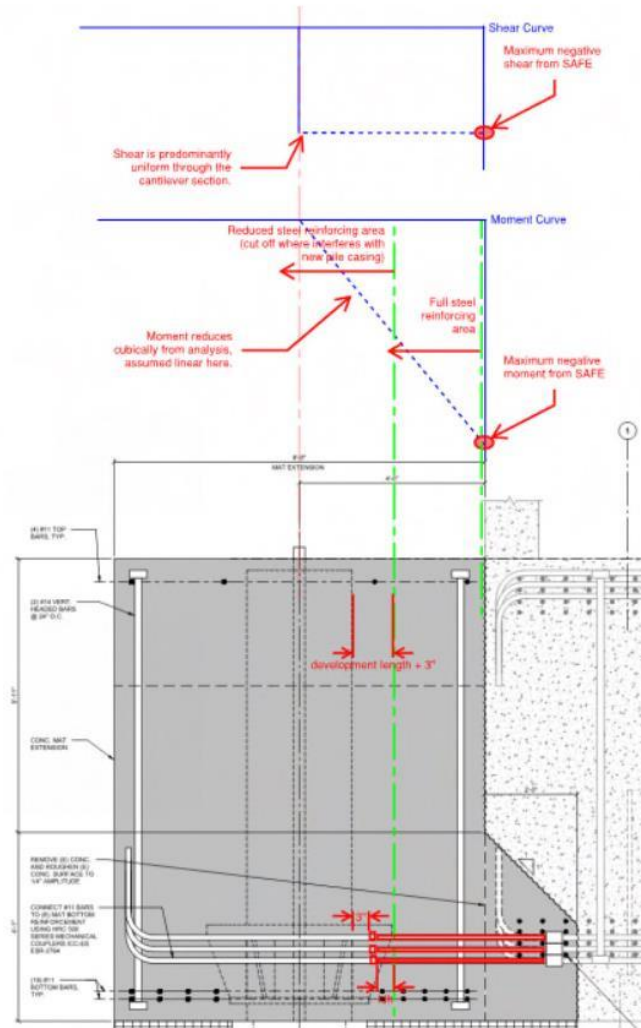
Schematic of pile cap extension showing new piles and reinforcing connection to existing concrete. Capacities are assessed at multiple sections along the length of the pile cap extension.
